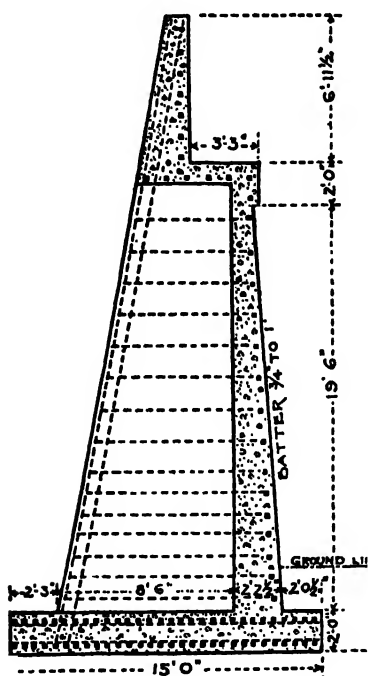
Section of Reinforced-Concrete Abutment.
